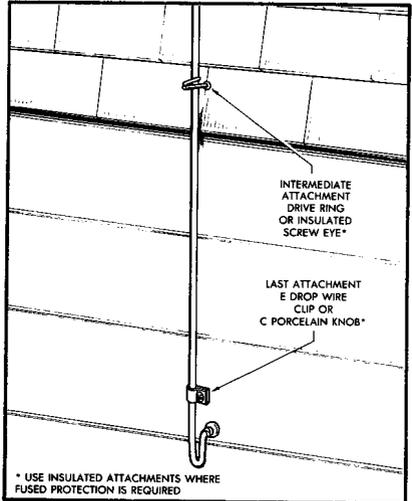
Drop Wire Crossing Wood or Stucco on Wood Building Projection
